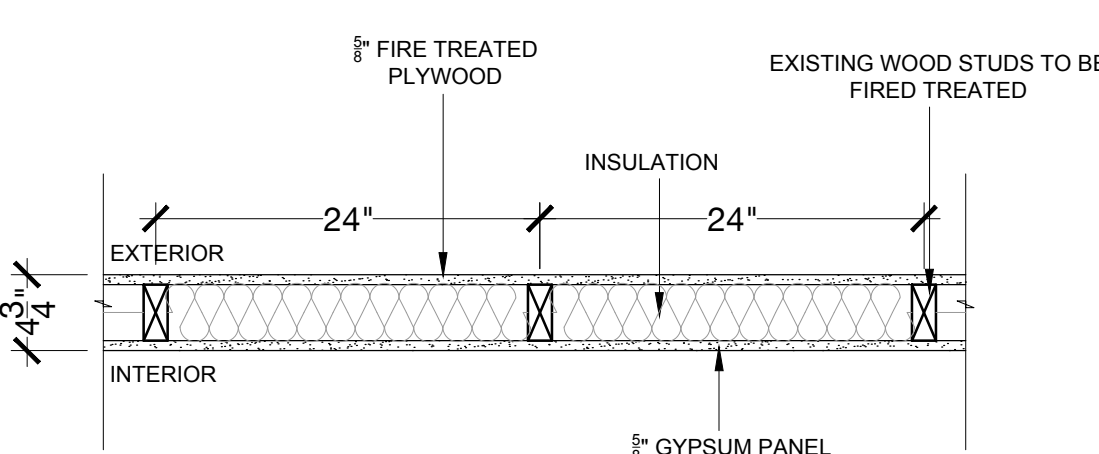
EXTERIOR WALL DETAIL - FIRE TREATED WOOD STUD SYSTEM
